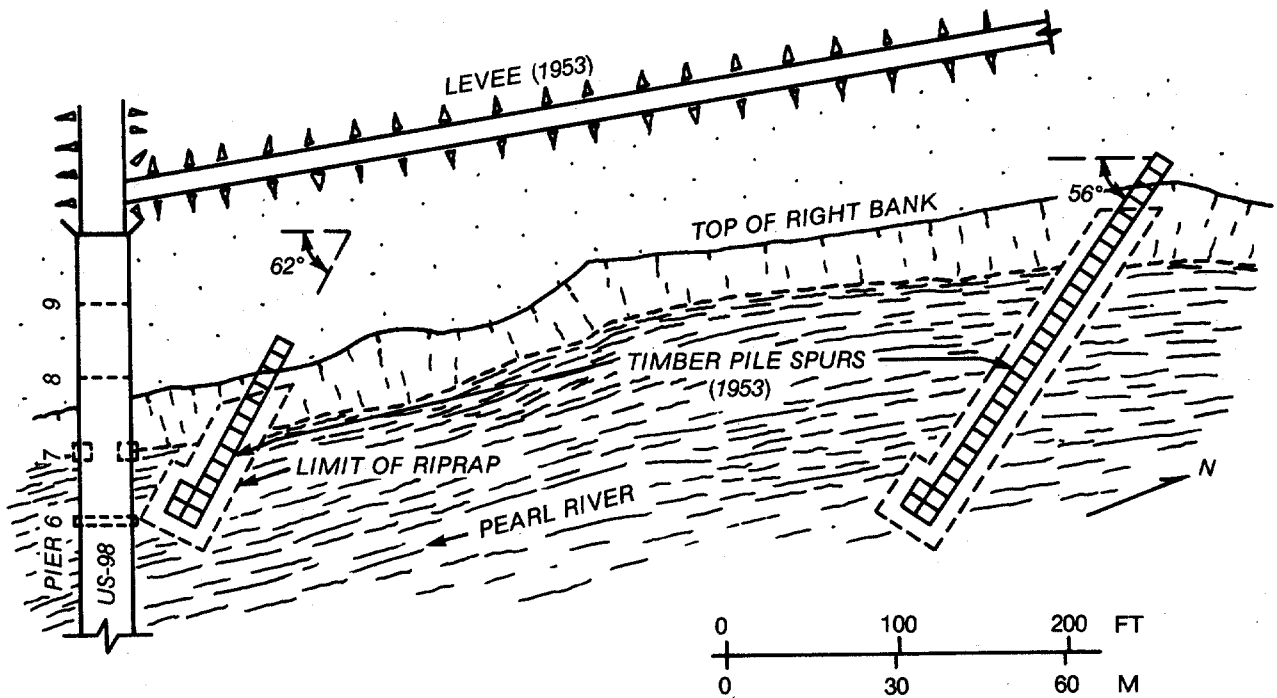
Plan sketch showing spurs and levee constructed in 1953.
